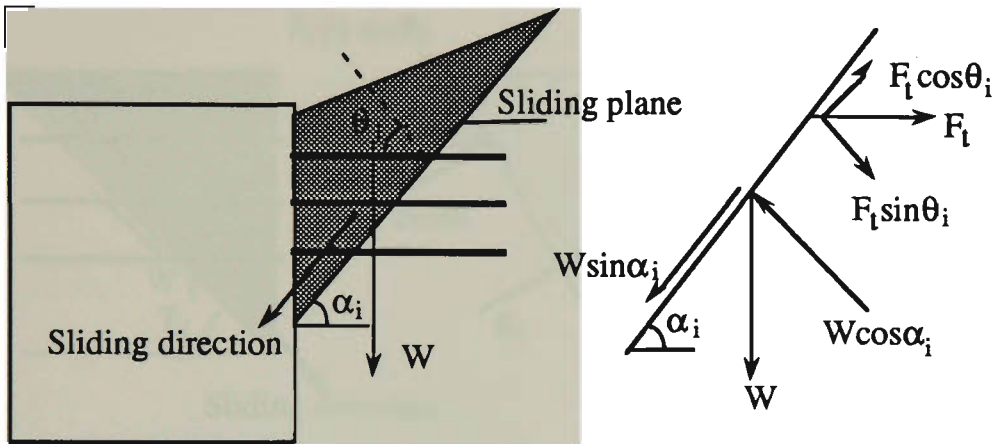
Prestressed bolts to reinforce a wedge sliding on a single plane
